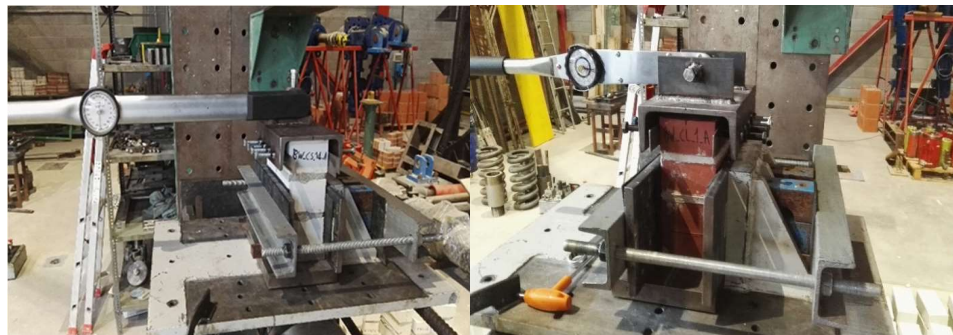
37: Setup for performing bond wrench tests on CS (left) and clay (right) brick masonry.
